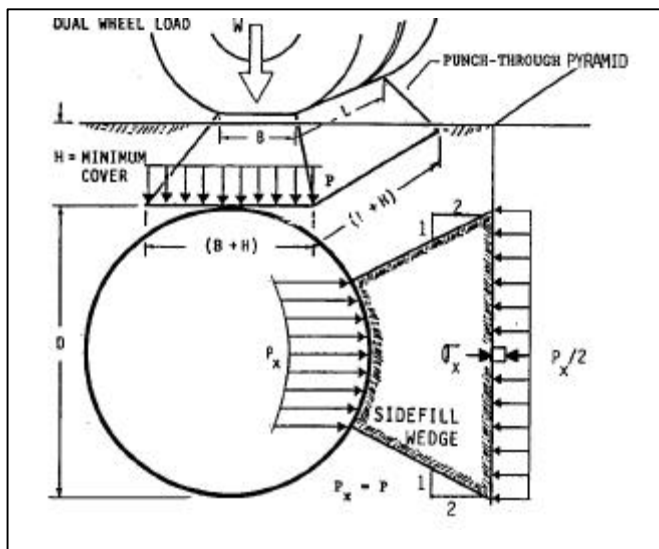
Trench wall support required for ring stability when a wheel load passes over a circular, flexible pipe with less-than-minimum soil cover. Active support for the wedge is negligible.
